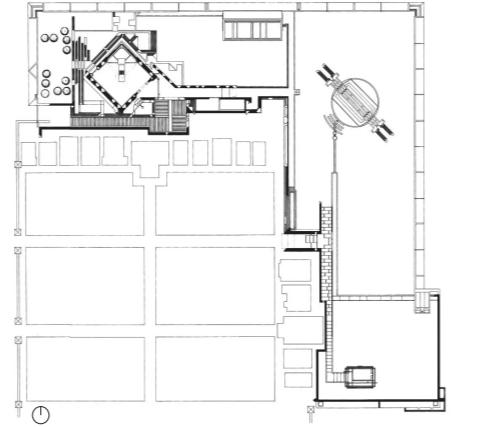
Floor Plan. Filippo Poli, "Carlo Scarpa Tomba Brion", Hicarquitectura. Accessed: August 6, 2025.
